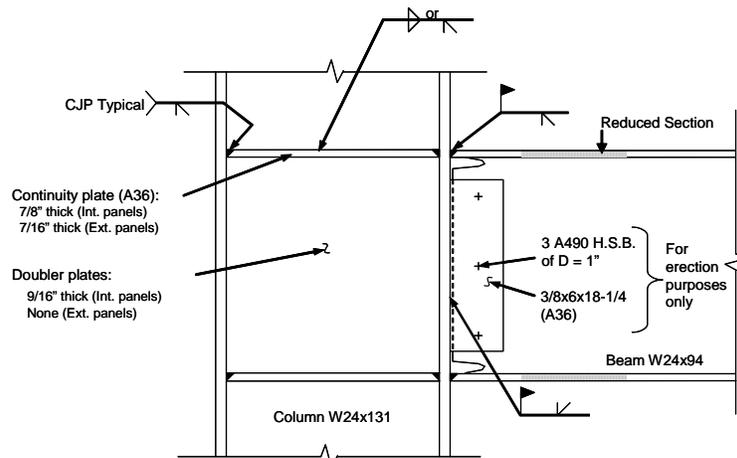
RBS Connection Details – Second Floor of Building in SDC D zone
